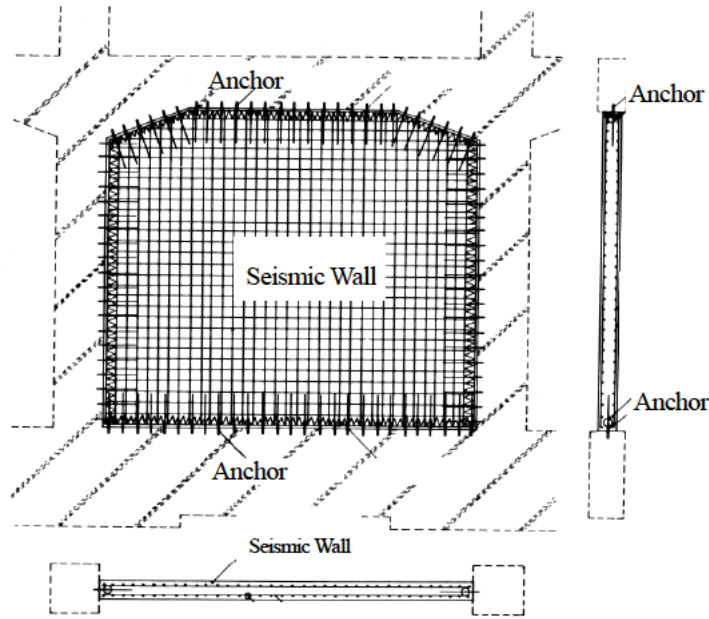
Construction of Seismic Wall into Frame Type Pier
